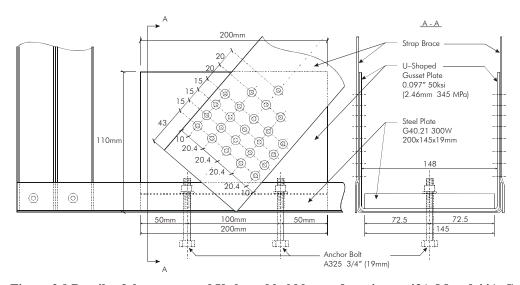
Details of the corner and U-shaped holddown of specimens 43A-M and 44A-C
